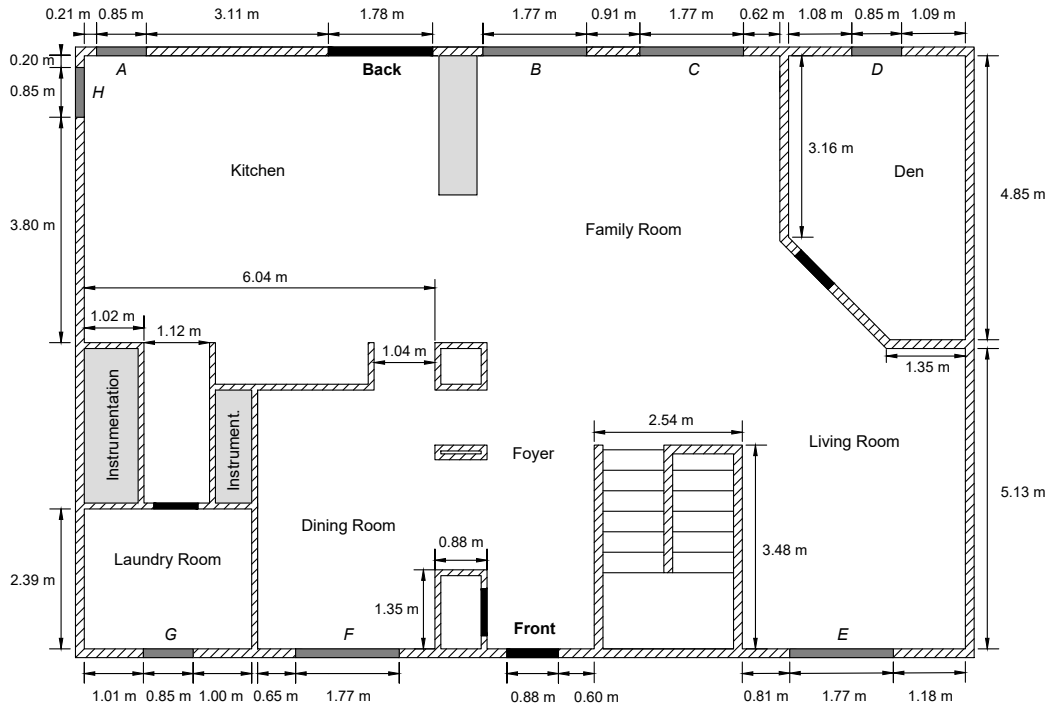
Dimensioned plan view drawing of the first story of the two-story structure
